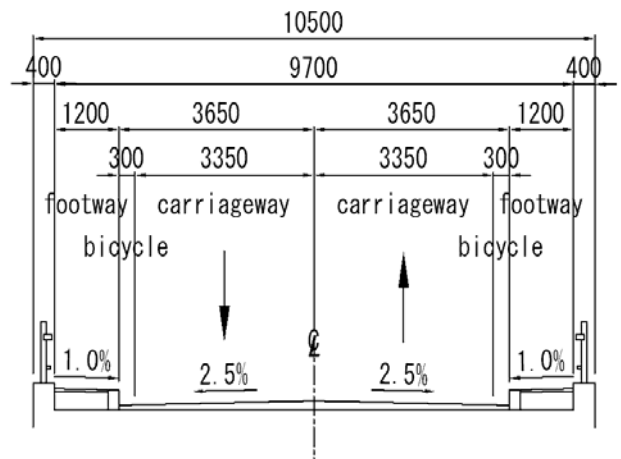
Crossfall of the South Rukuru Bridge
